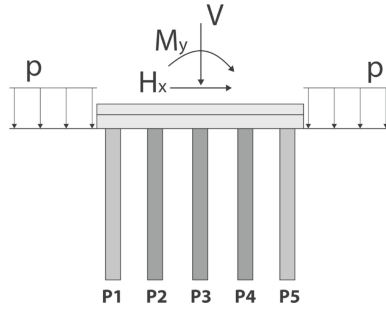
Geometrical scheme (longitudinal section) with applied loads.
